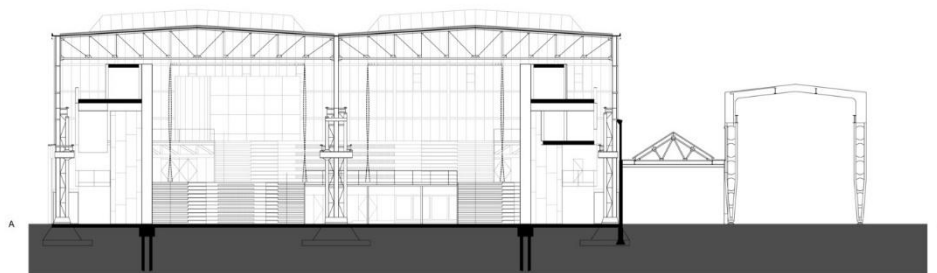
Longitudinal section AA of LocHal Library, Tilburg, showing structural adaptation and spatial layering within the repurposed locomotive hall.
